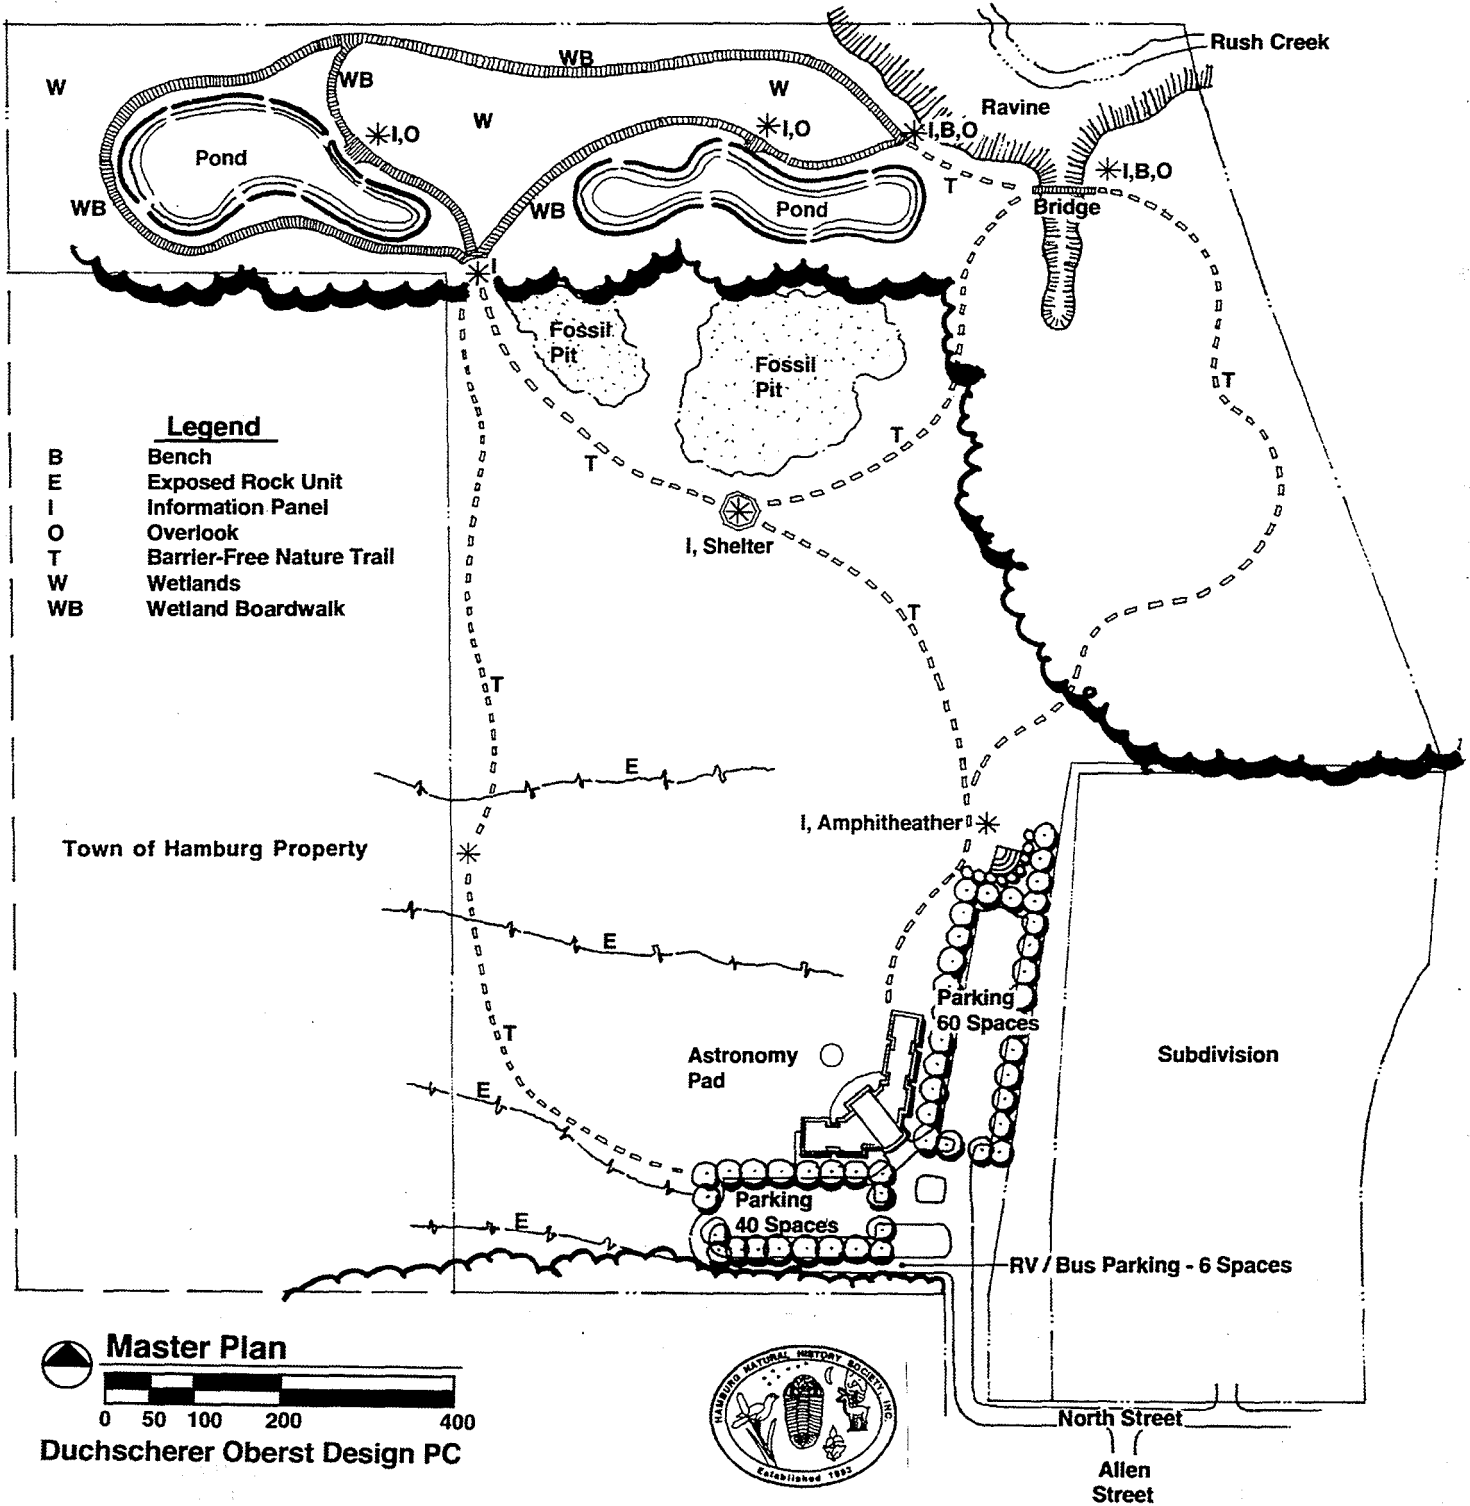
Proposed site plans for 32.5 acre Penn Dixie Paleontological and Outdoor Education Center in Hamburg, New York.
